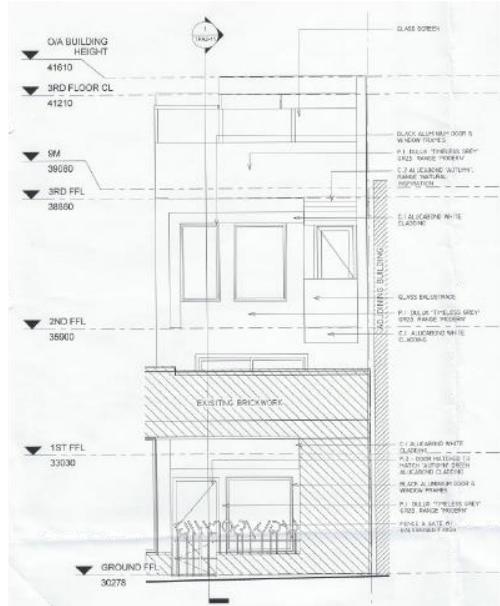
Excerpt of Endorsed West Elevation under Permit No. PLN14/0664
